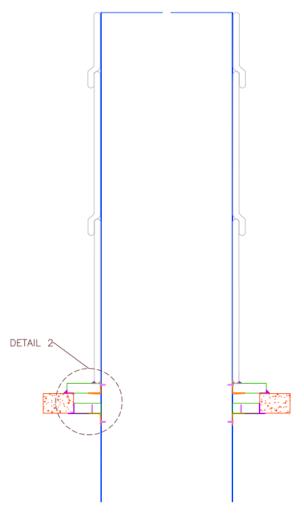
Duct section view B (Section along the diagonal of separating element)
